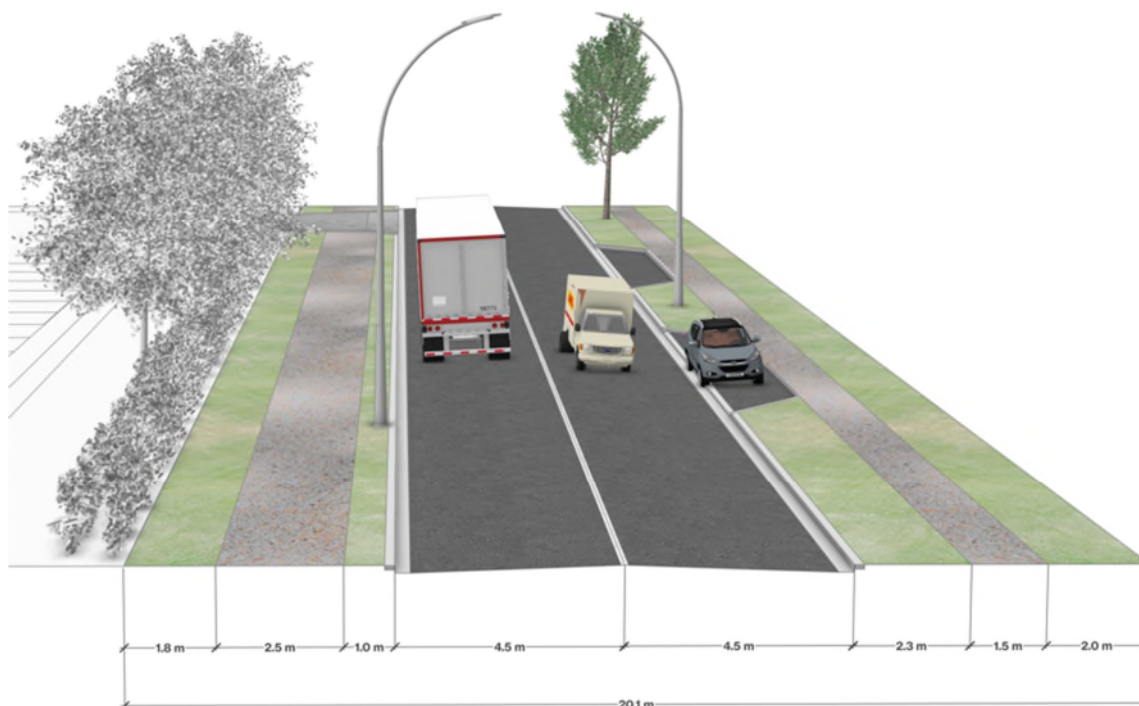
e: Indicative Old Ruffell Road upgrade cross section
